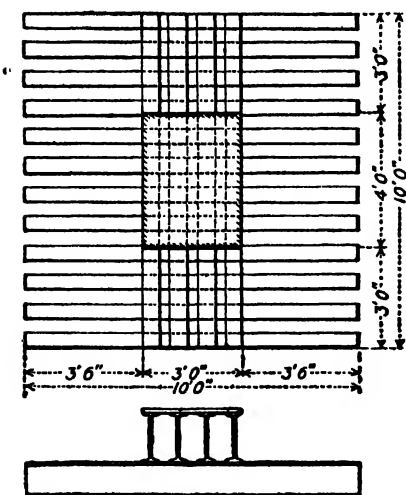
Steel I-Beam Grillage for a Single Column.
